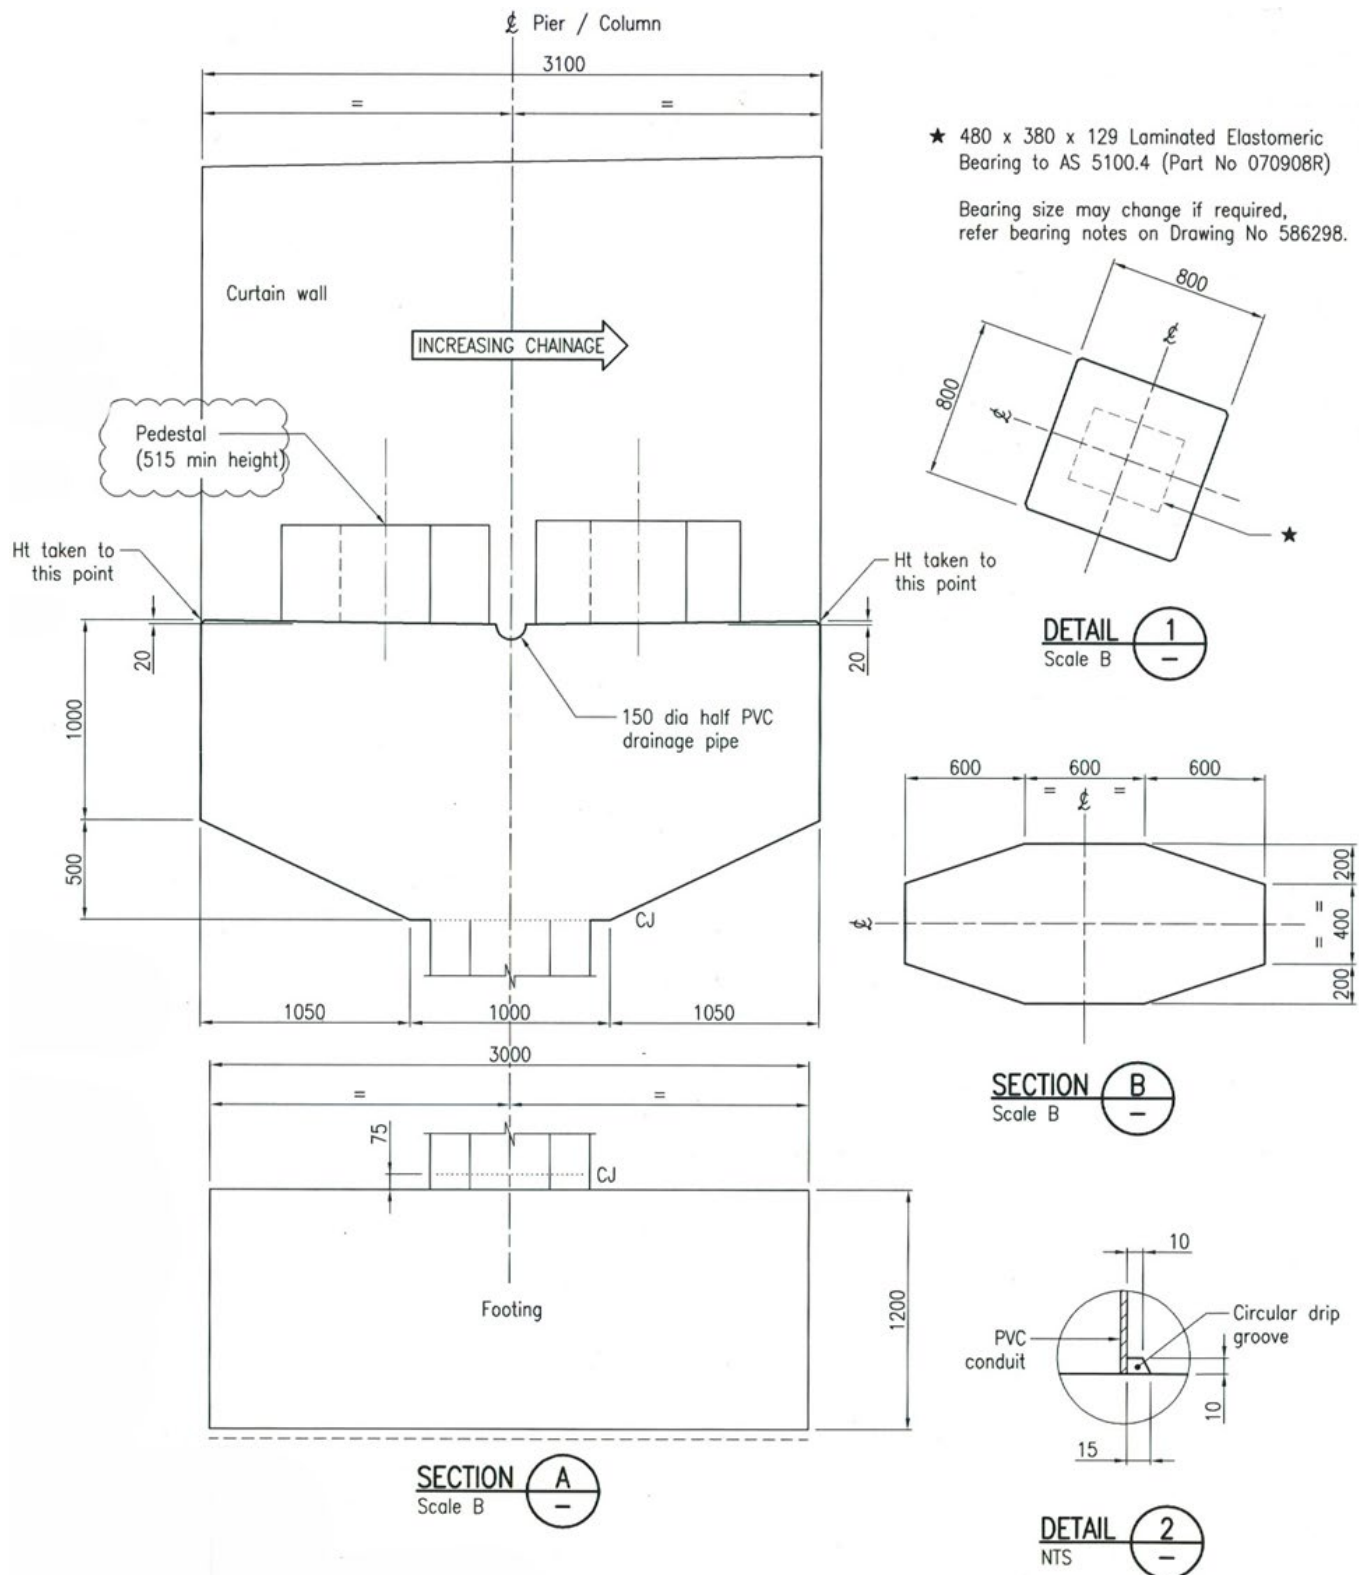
(e) - Example sections showing pier on columns with spread footing
